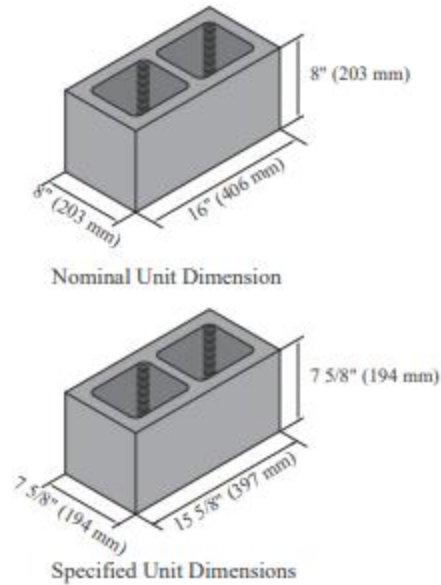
Schematic of Concrete Masonry Unit (CMU) nominal and specified dimensions (National Concrete Masonry Association 2020)
